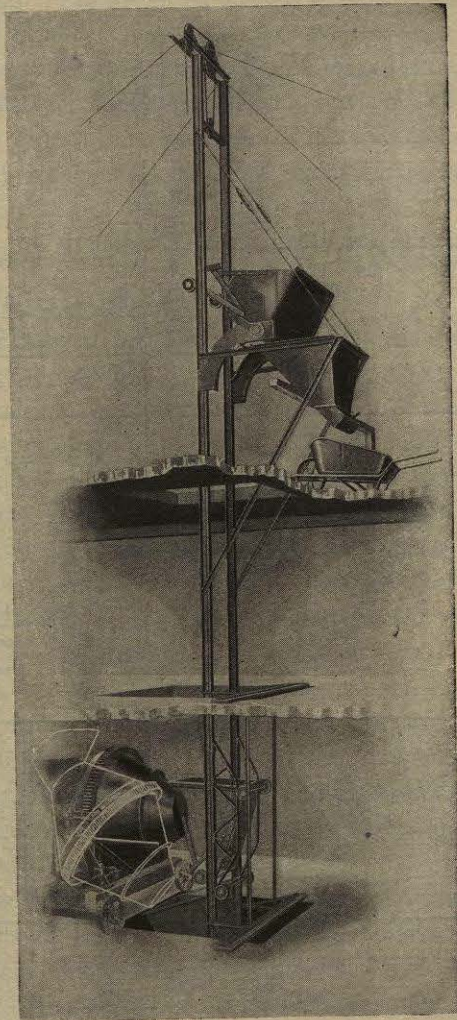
Automatic Dumping Concrete Elevator. (See p. 267.)
